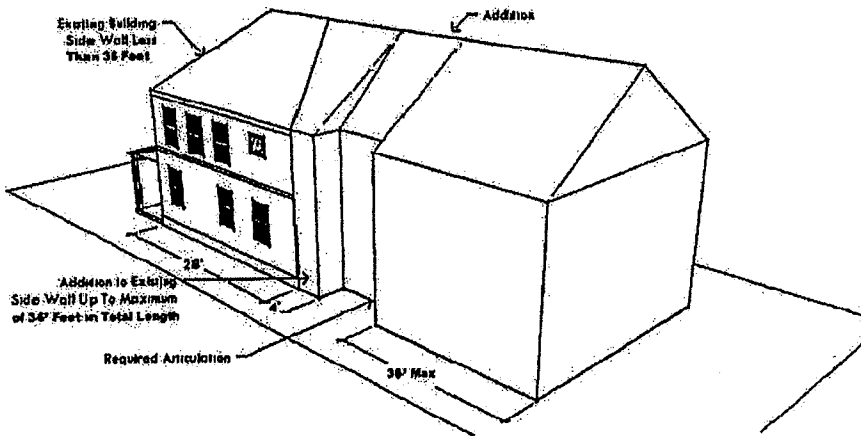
Side Wall Articulation (Existing Side Wall Less Than or Equal to 36 Feet)
